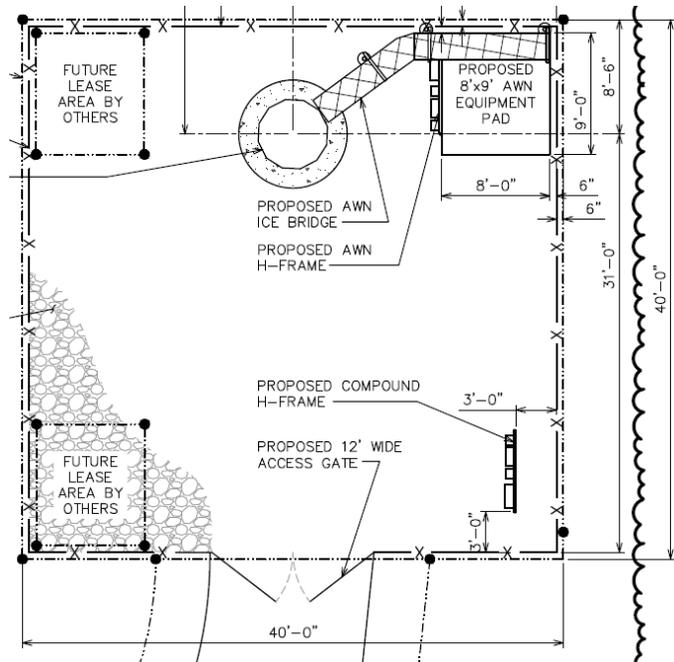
PROPOSED LEASE SITE LAYOUT.
